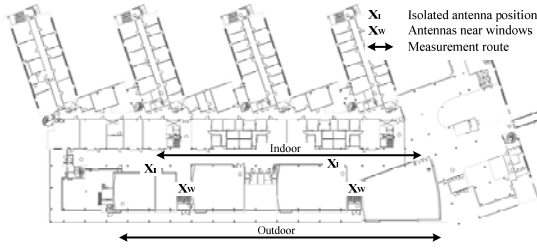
Layout of the building with indoor network and the indoor and outdoor measurement routes.
